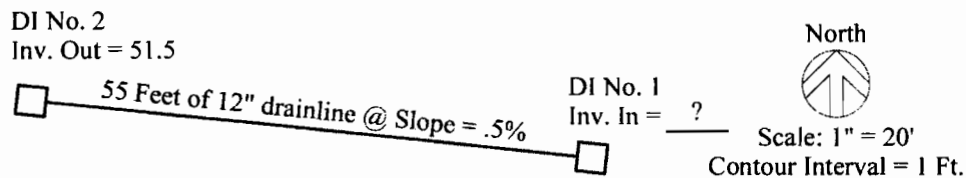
Finding an Unknown Elevation When One Elevation is Known
